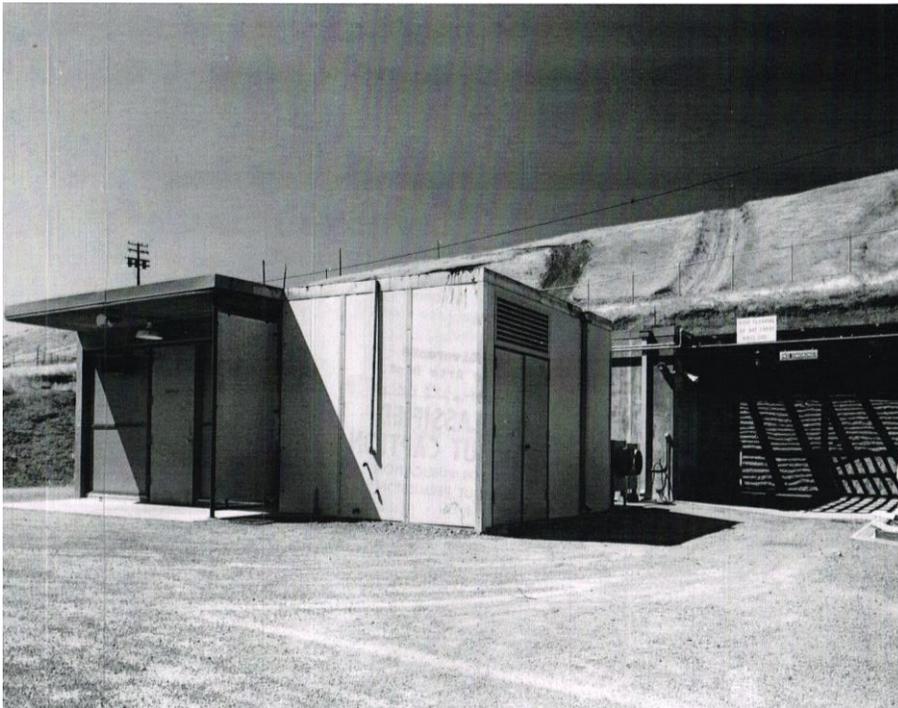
View of Building 825 looking southwest just after construction, note the shrapnel baffles extending to the hillside, ca. 1959.
